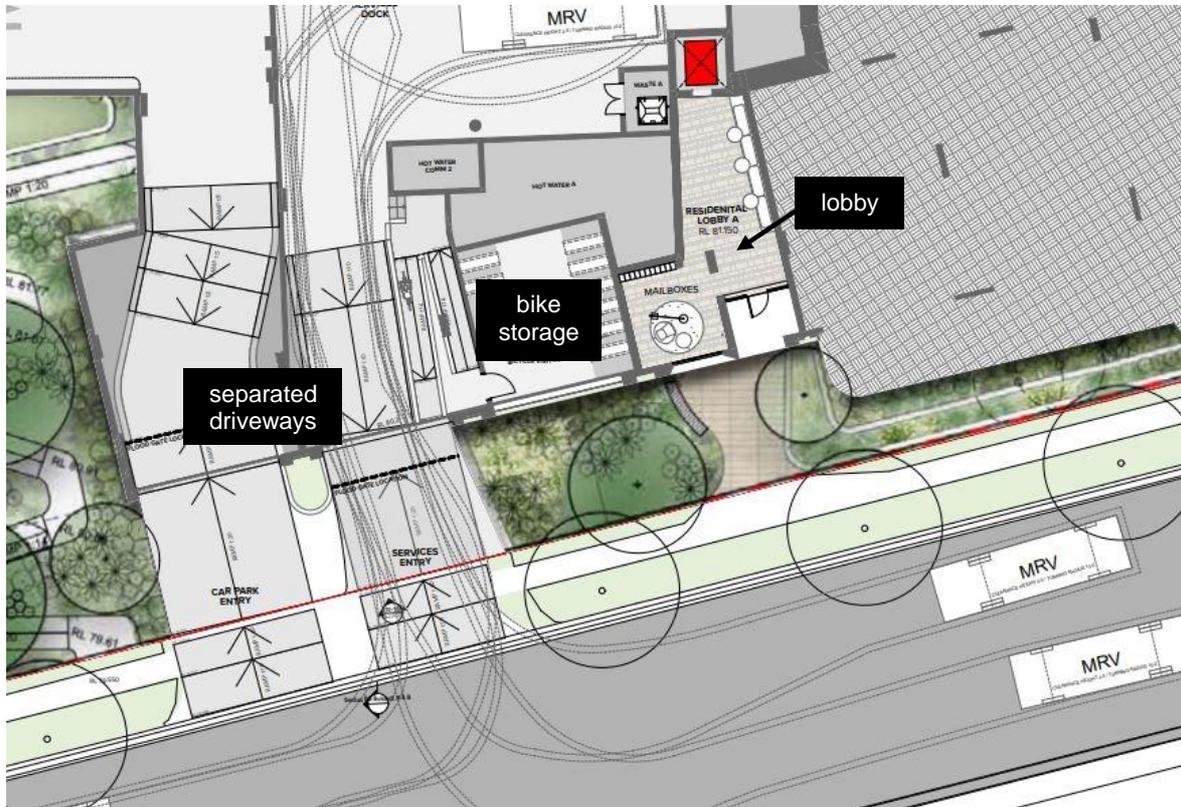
| Originally proposed ground floor of Building A (Source: Applicant's EIS)
